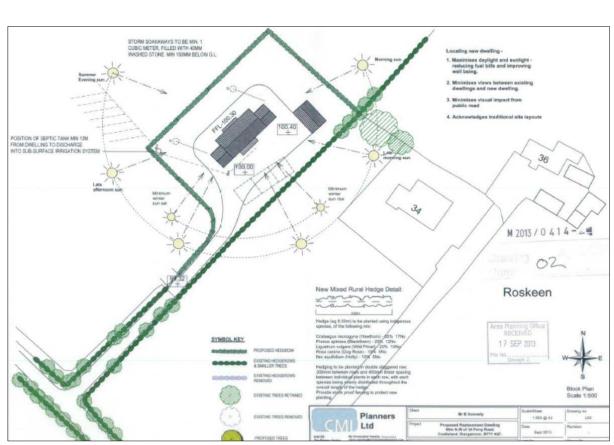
Block plan of dwelling and garage approved under M/2013/0414/F
